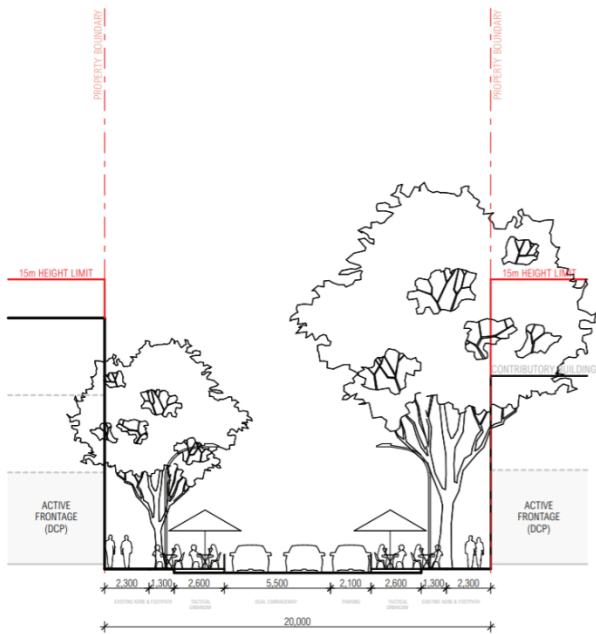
Indicative street section – Wyndham Street, North Alexandria
